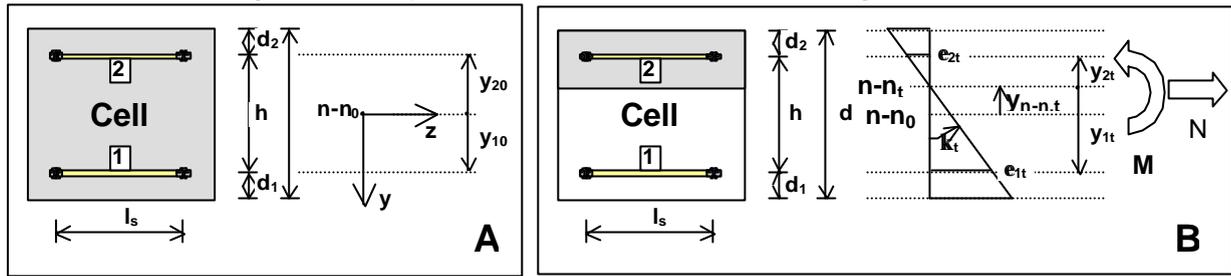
Parallel topology in a segment of non-cracked (A) and cracked (B) concrete beam
